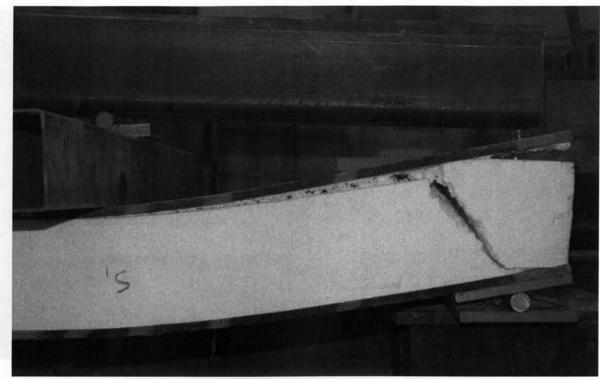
Close-up view of the diagonal shear crack in the foam at support of specimen S-1
